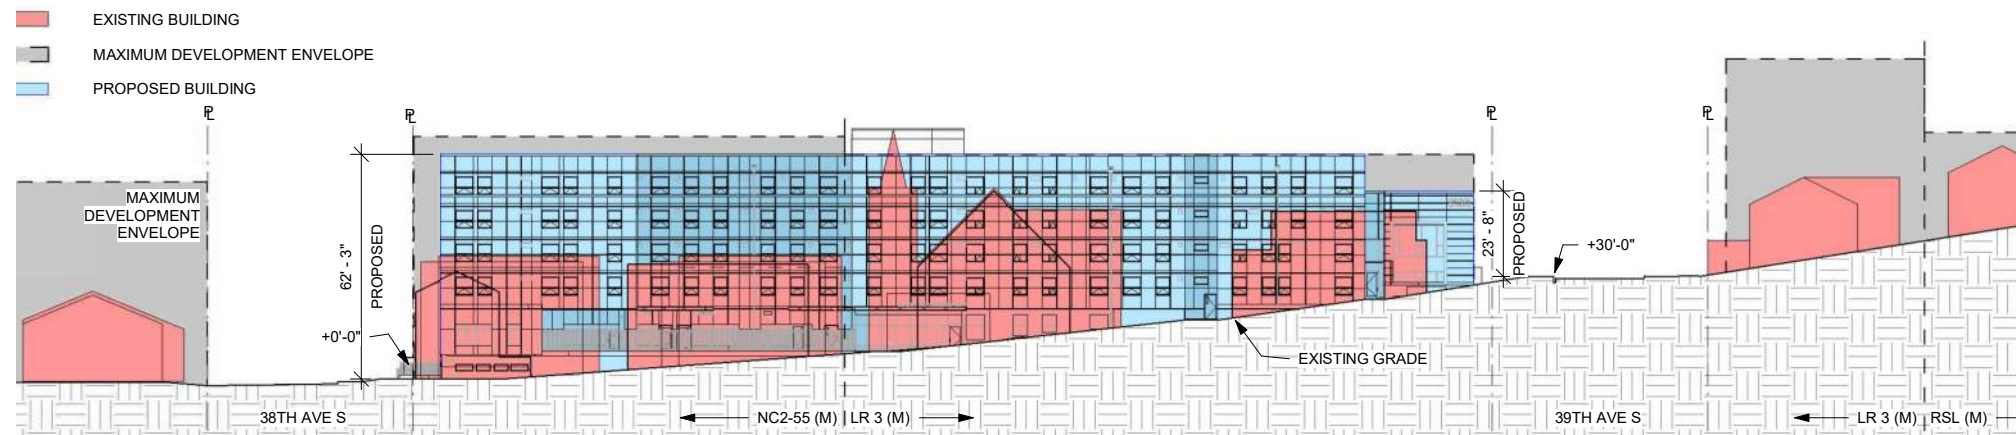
Elevation showing existing buildings, existing slope, proposed building massing, maximum development envelope, and forfeited building mass
